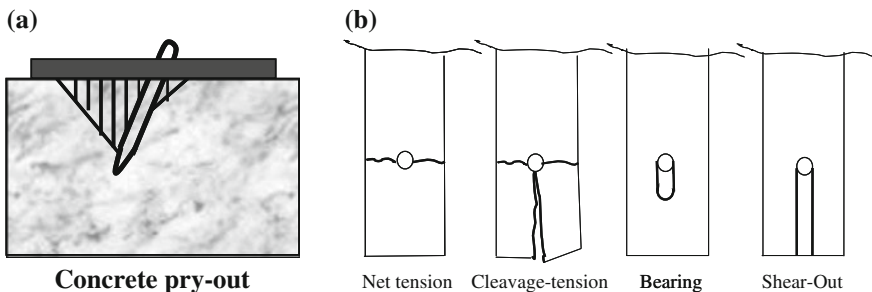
a Concrete pry-out failure; b typical failure modes of mechanically fastened connections in FRP
